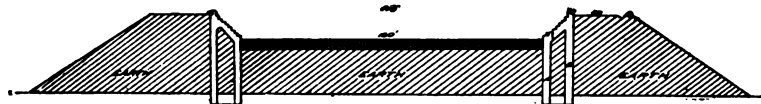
Cross-Section of Solani Aqueduct Embankment.
